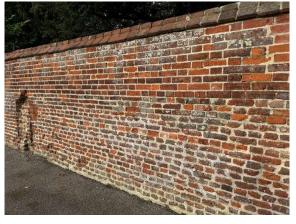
Brick wall, Heydonbury, Heydon Lane, detail of older brick wall
